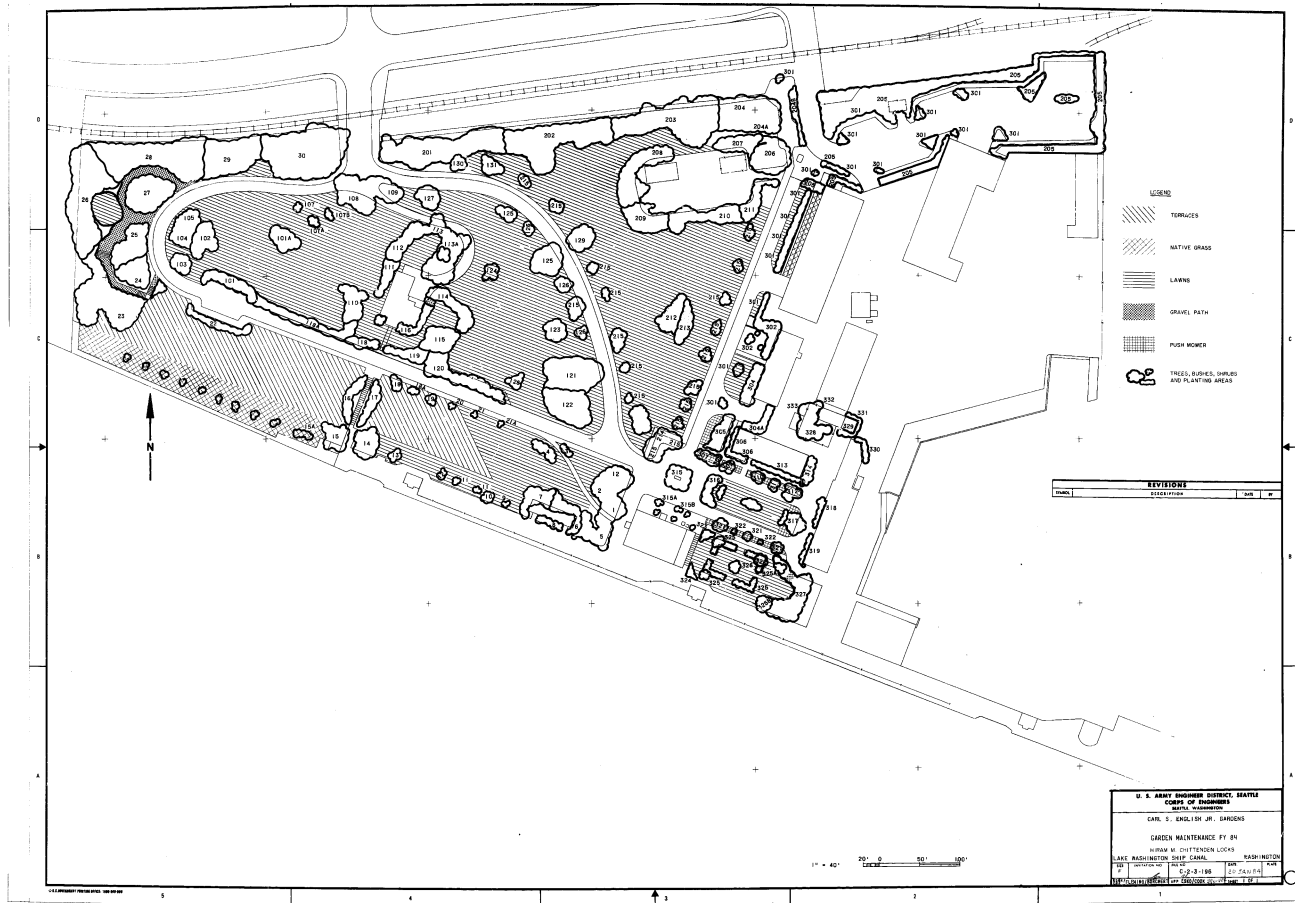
C-2-3-196 grounds and garden beds 1984. Locks archives
